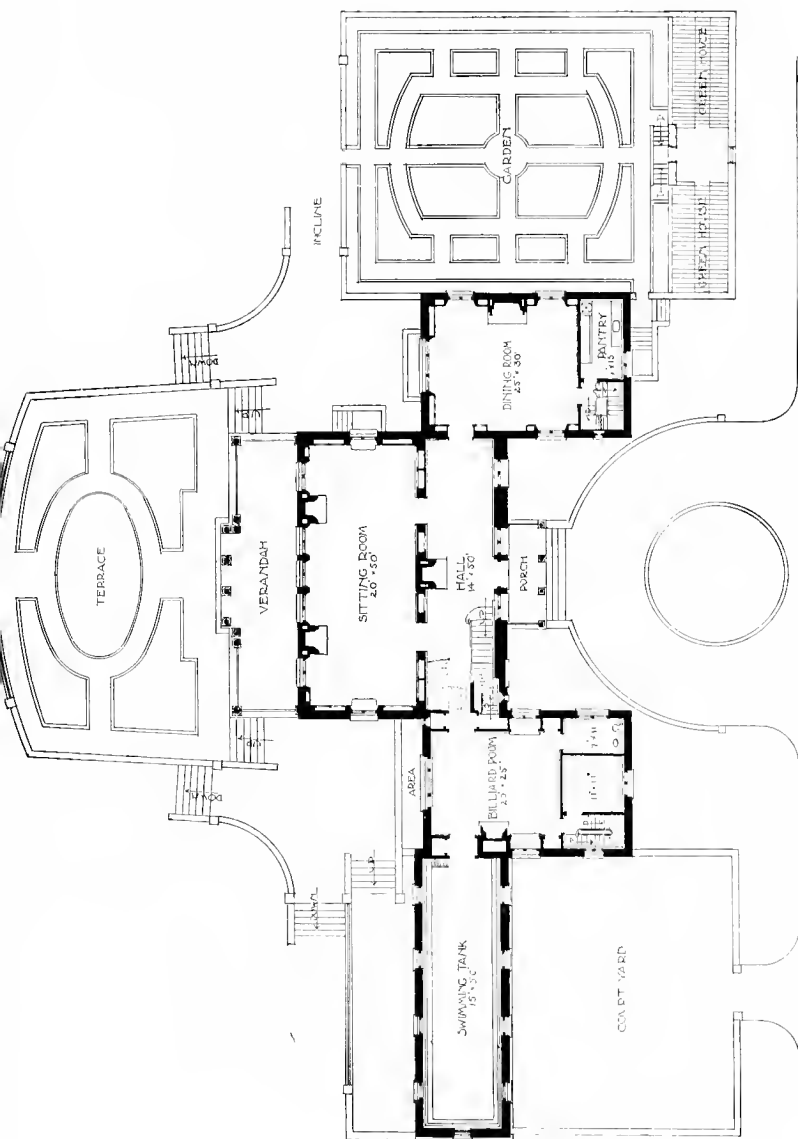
FIRST FLOOR PLAN OF ERNEST FLAGG'S RESIDENCE, DONGAN HILLS, S. I.
